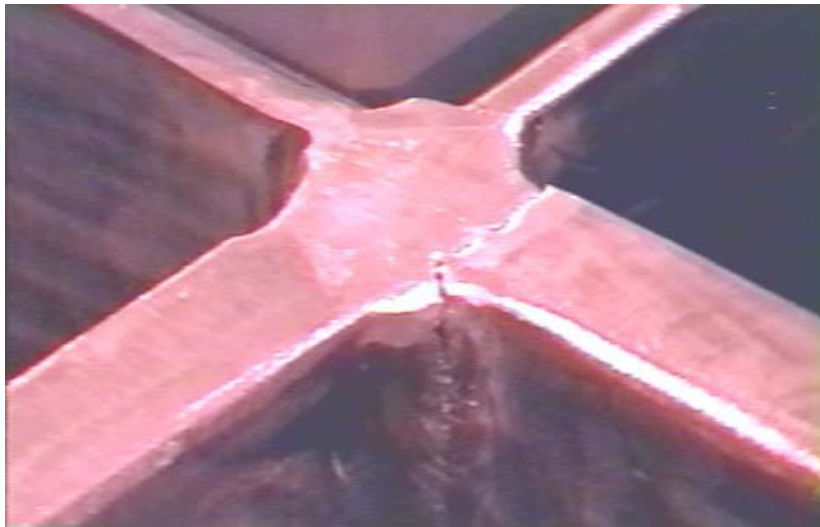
Existing 1985 weld crack at location No. 4 identified in Figure G-9.
